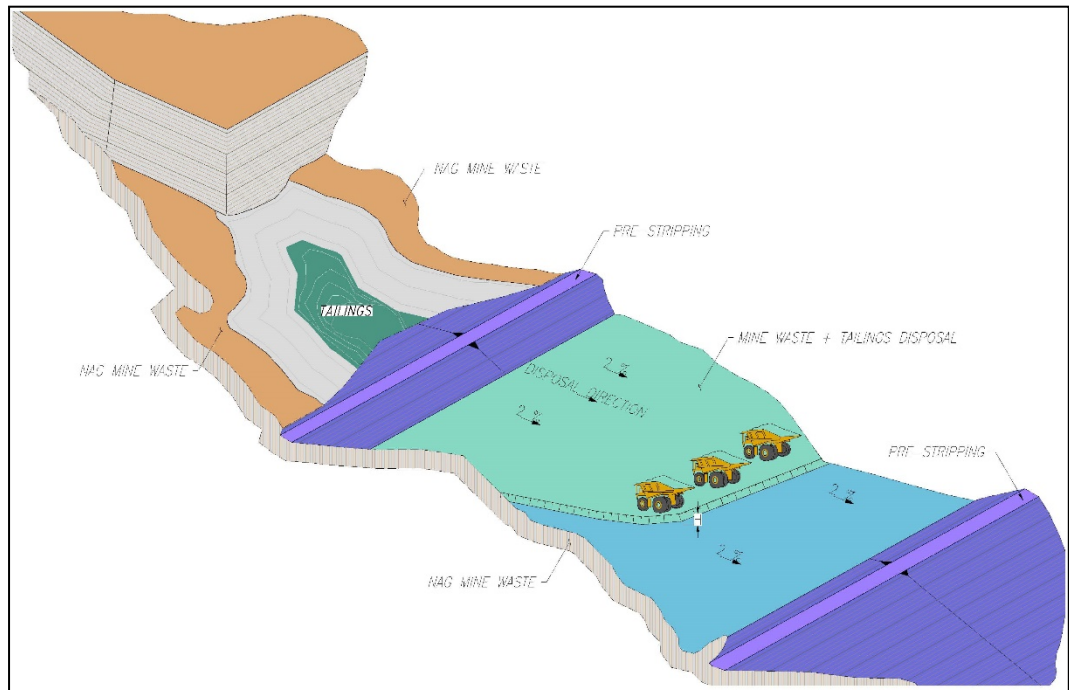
Mine waste-filtered tailings co-disposal in single layer
